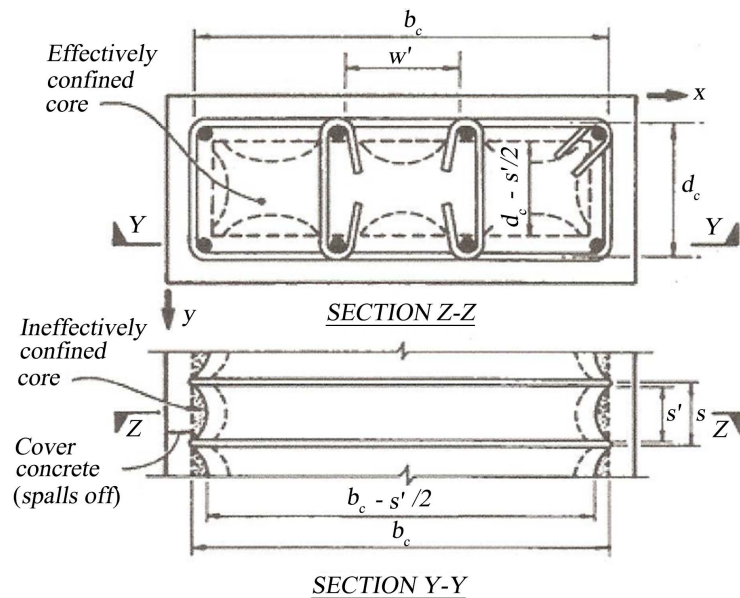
Concrete element reinforcement details. The positions of compacted concrete can be seen.
